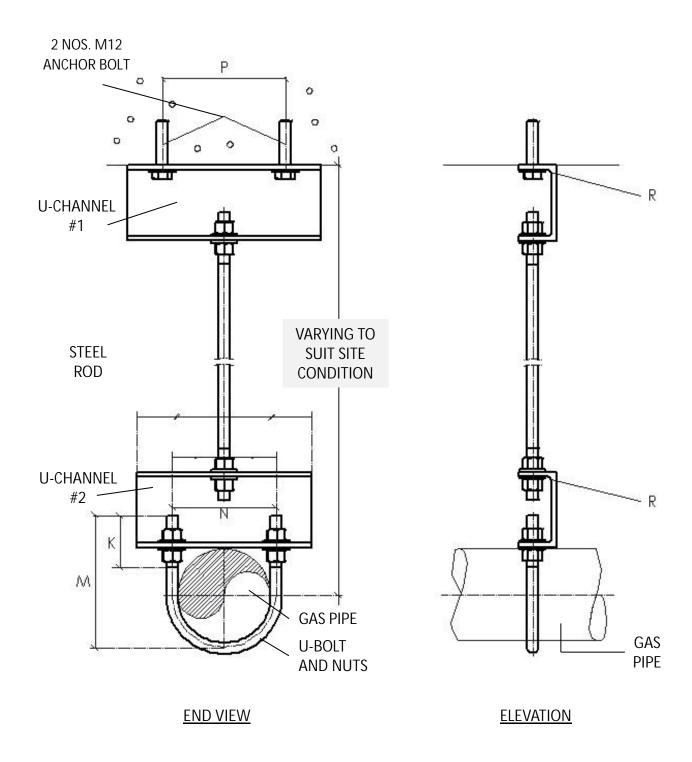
Typical Horizontal Pipe Support for Gas Pipe (I)
